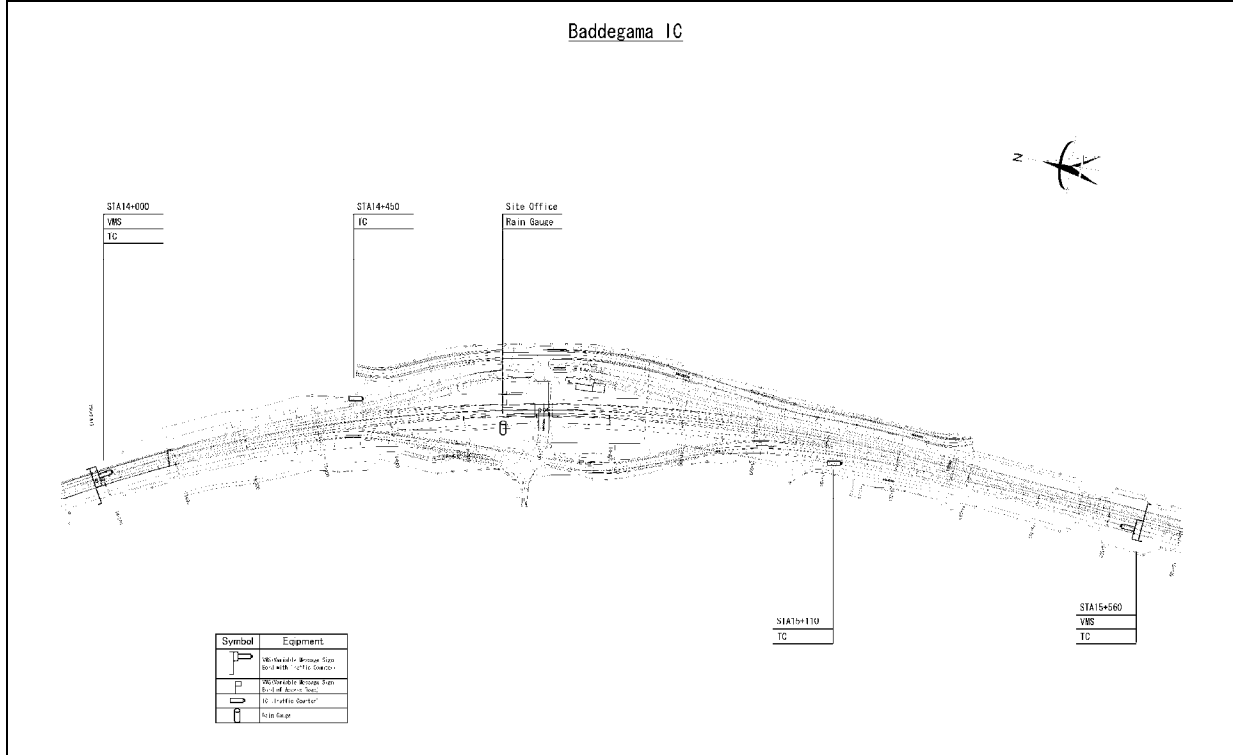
Road side equipment layout plan (Baddegama IC)
